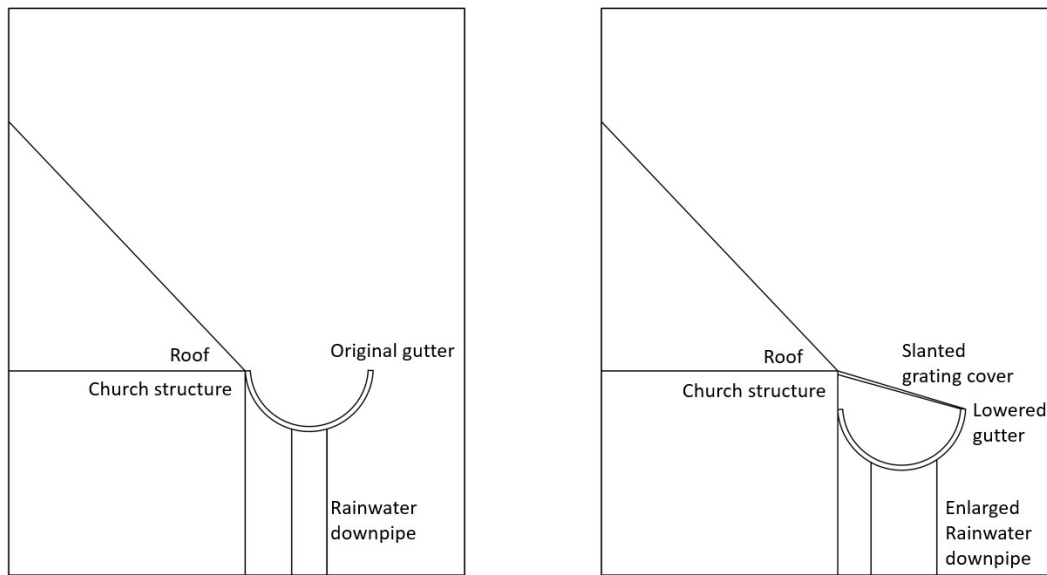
Proposed improvement to the rooftop gutter system to avoid clogging (current condition (left) and proposed improvements (right))
